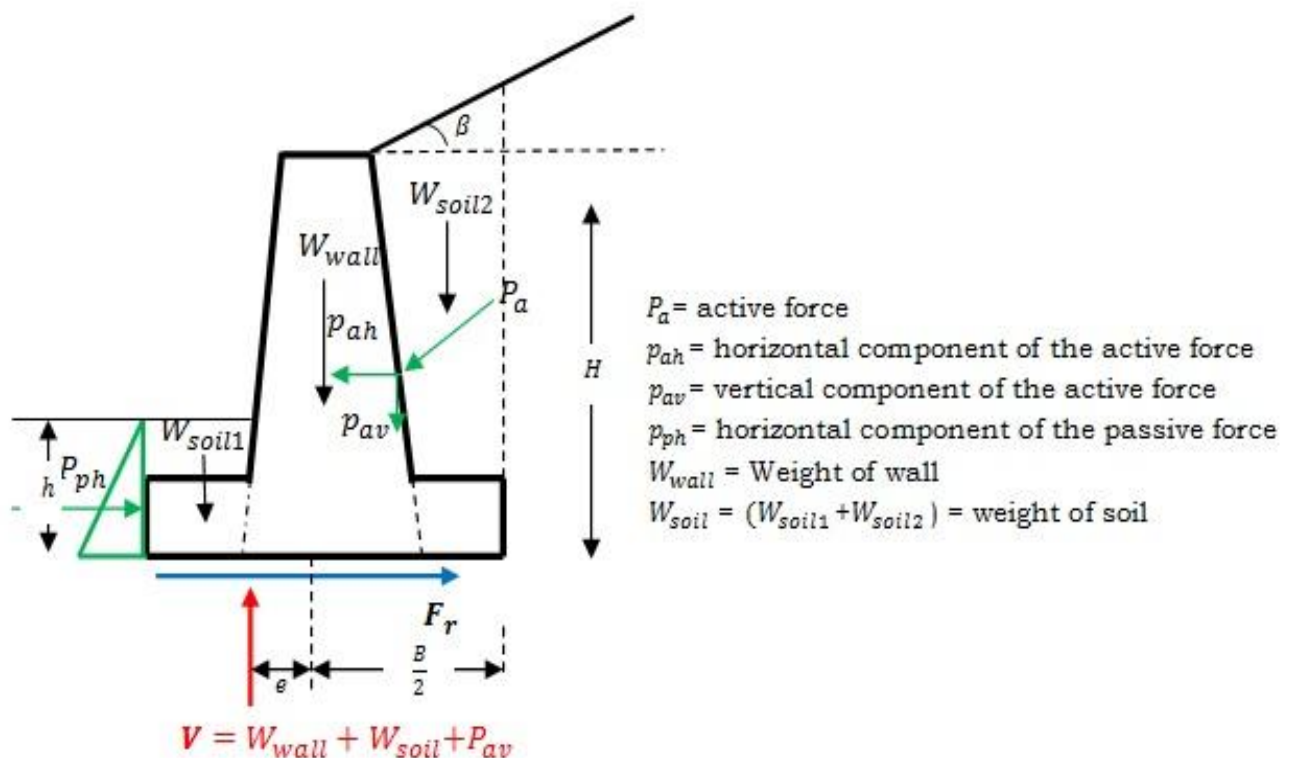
Forces involved in the sliding stability of retaining wall [9][10]
